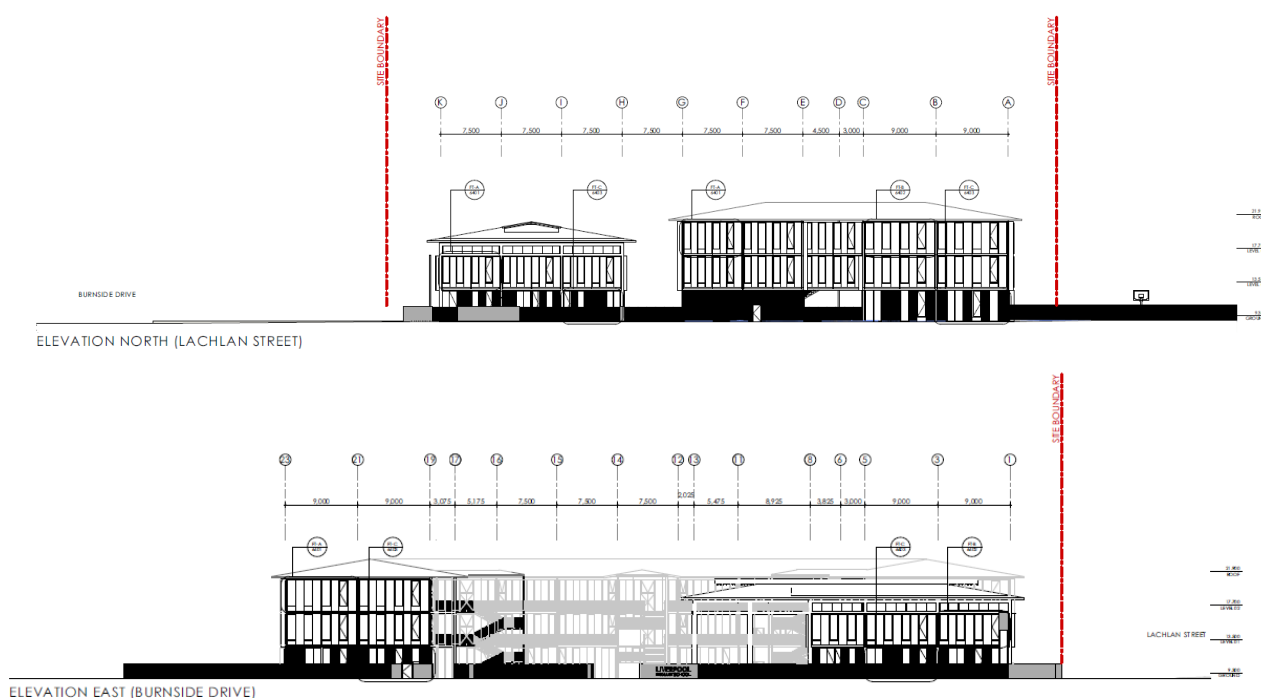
Northern Elevation (top) and Eastern Elevation (bottom)
